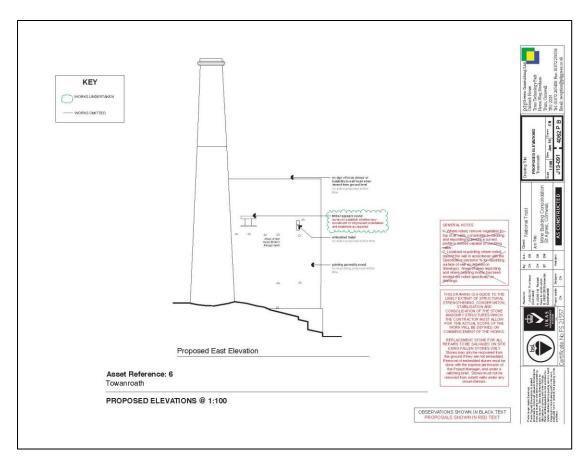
Eastern external elevation of Towanroath pumping engine house.
